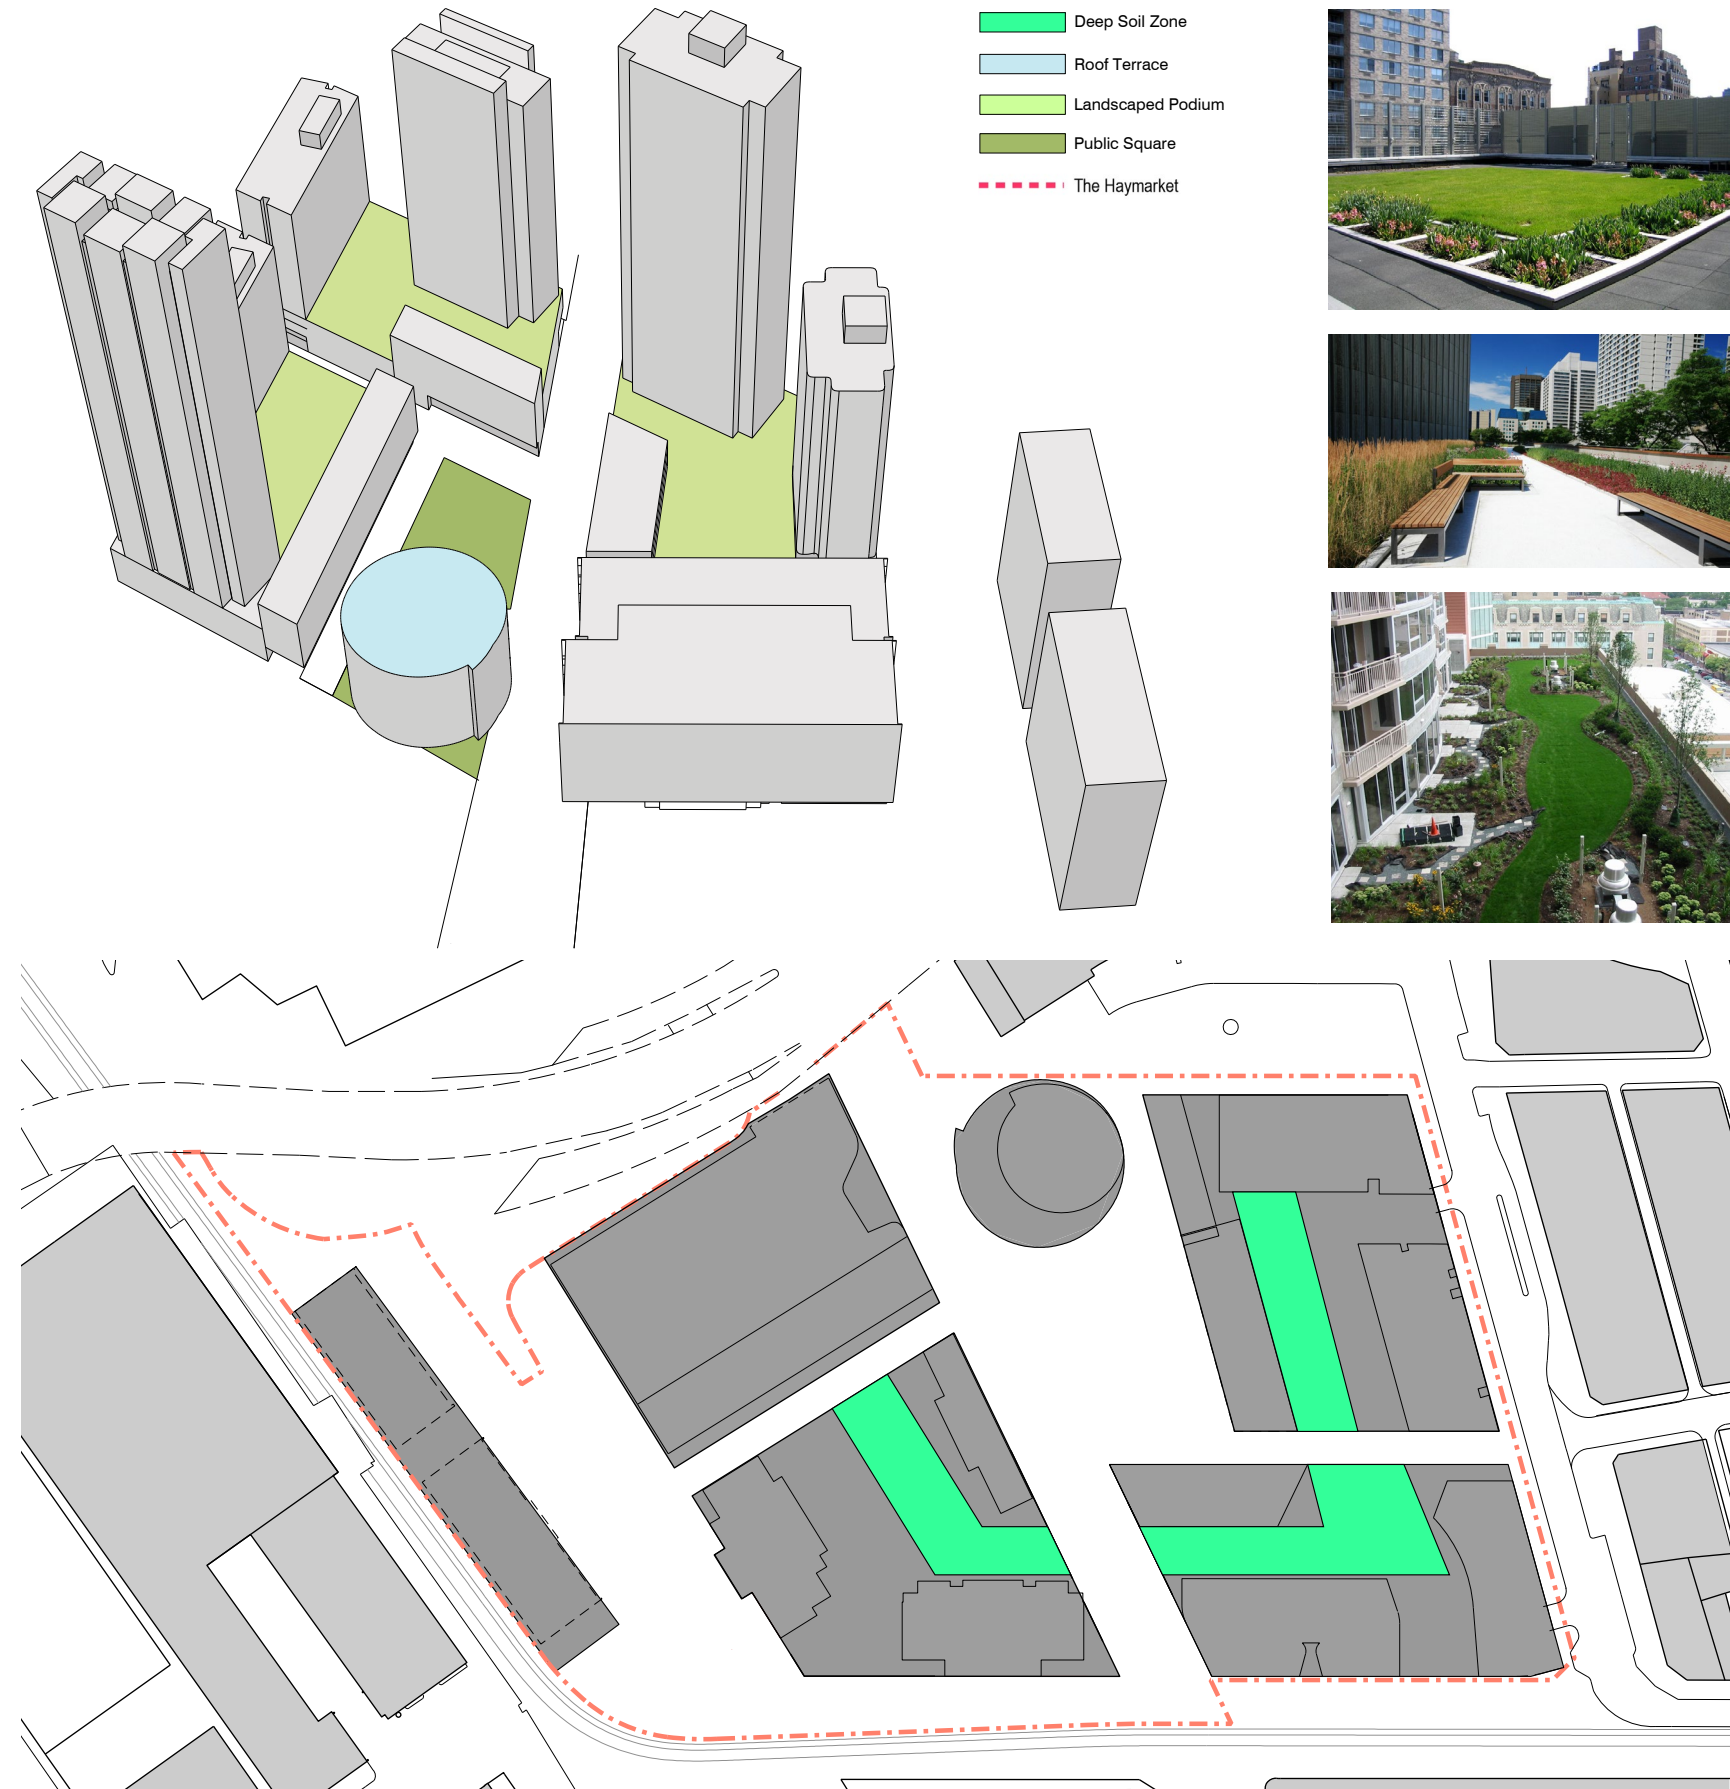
Illustrative podium roof diagram indicating landscape zones
